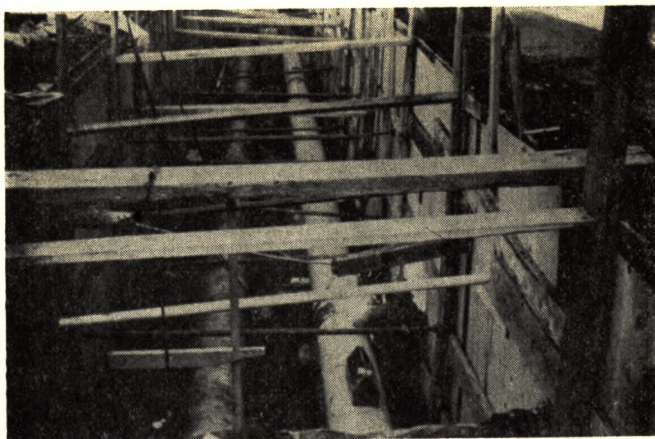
Four lines laid in street trenches distribute and return steam and chilled water.
